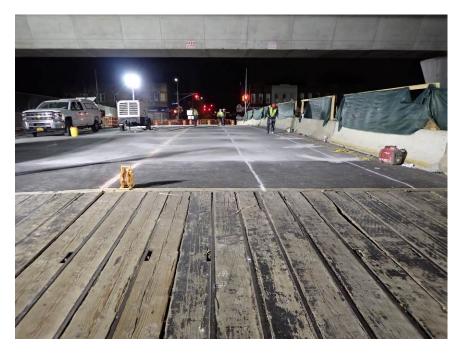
Top of deck view of temporary timber deck panels at the 109th Avenue Bridge east abutment, looking west.
